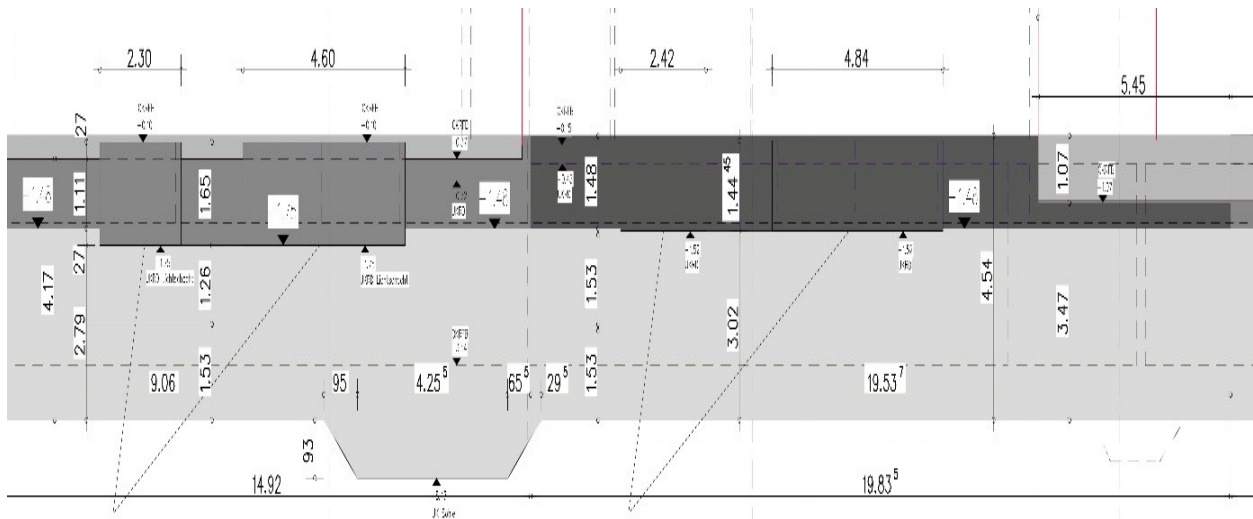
Single-layer vertical decoupling (medium grey), double-layer decoupling (dark grey) and Cibatur® (medium grey) due to different shoring types in Building 1
